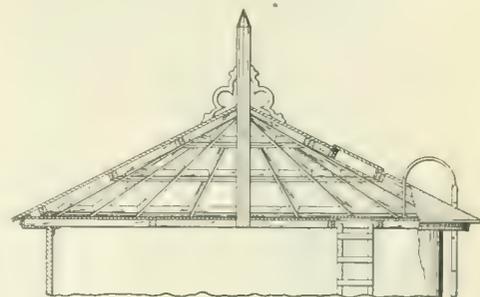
Example of Good Design of Double Roof for an Elevated Water Tank.
